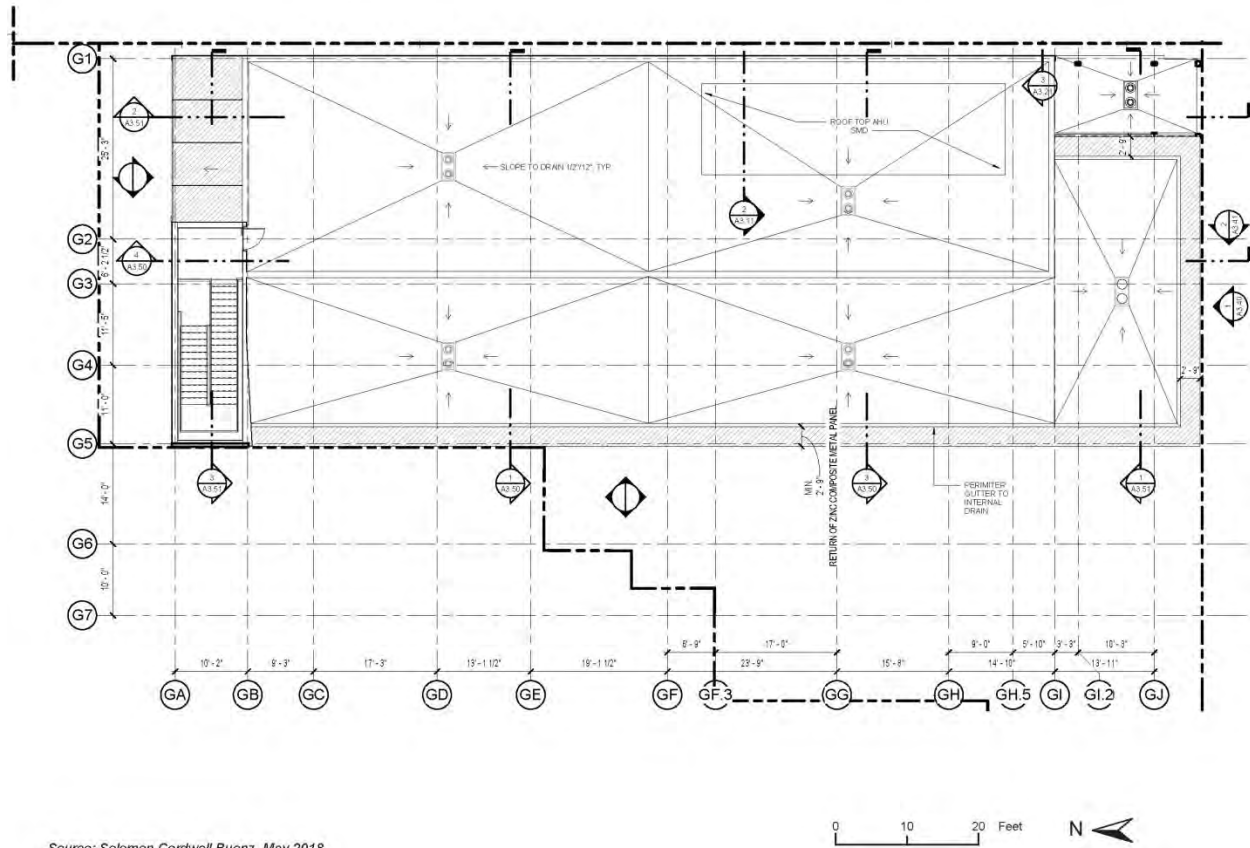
ACADEMIC BUILDING ROOF PLAN
